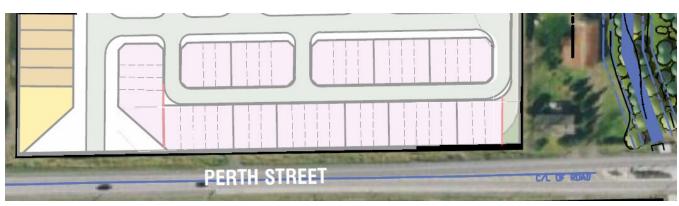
Close-Up of Proposed Rear-Lane Townhouse Layout
